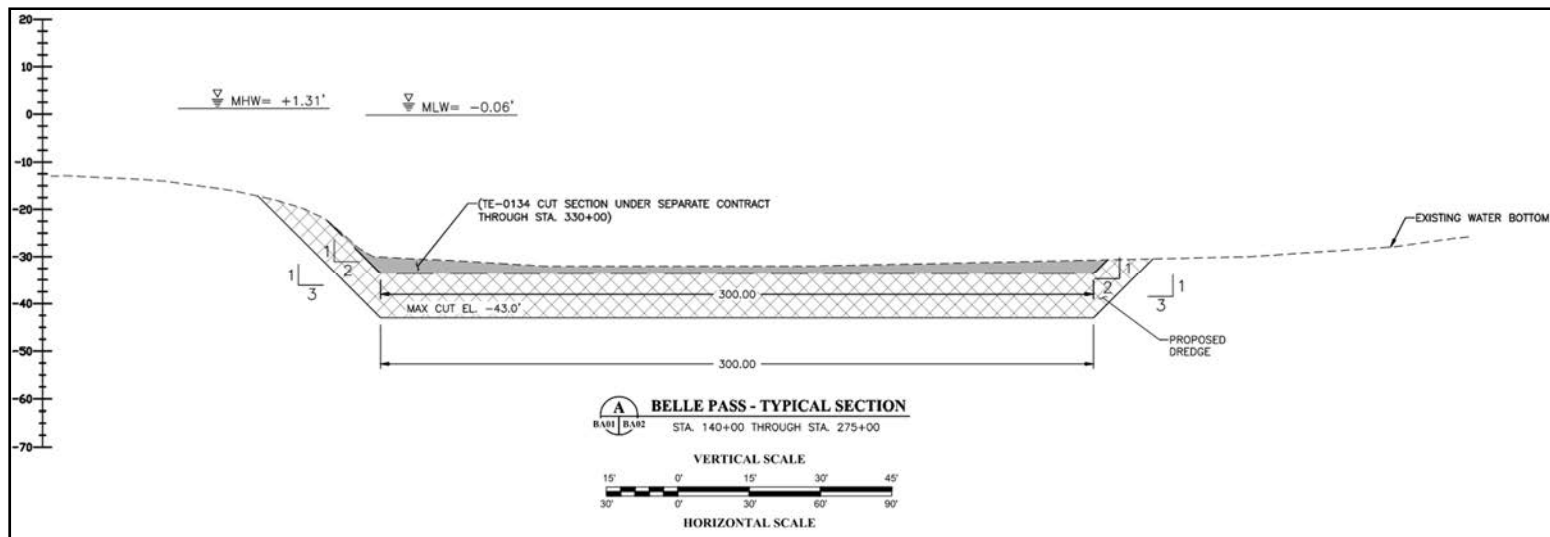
BA Typical Dredging Cross Section Sta. 140+00 to Sta. 275+00
